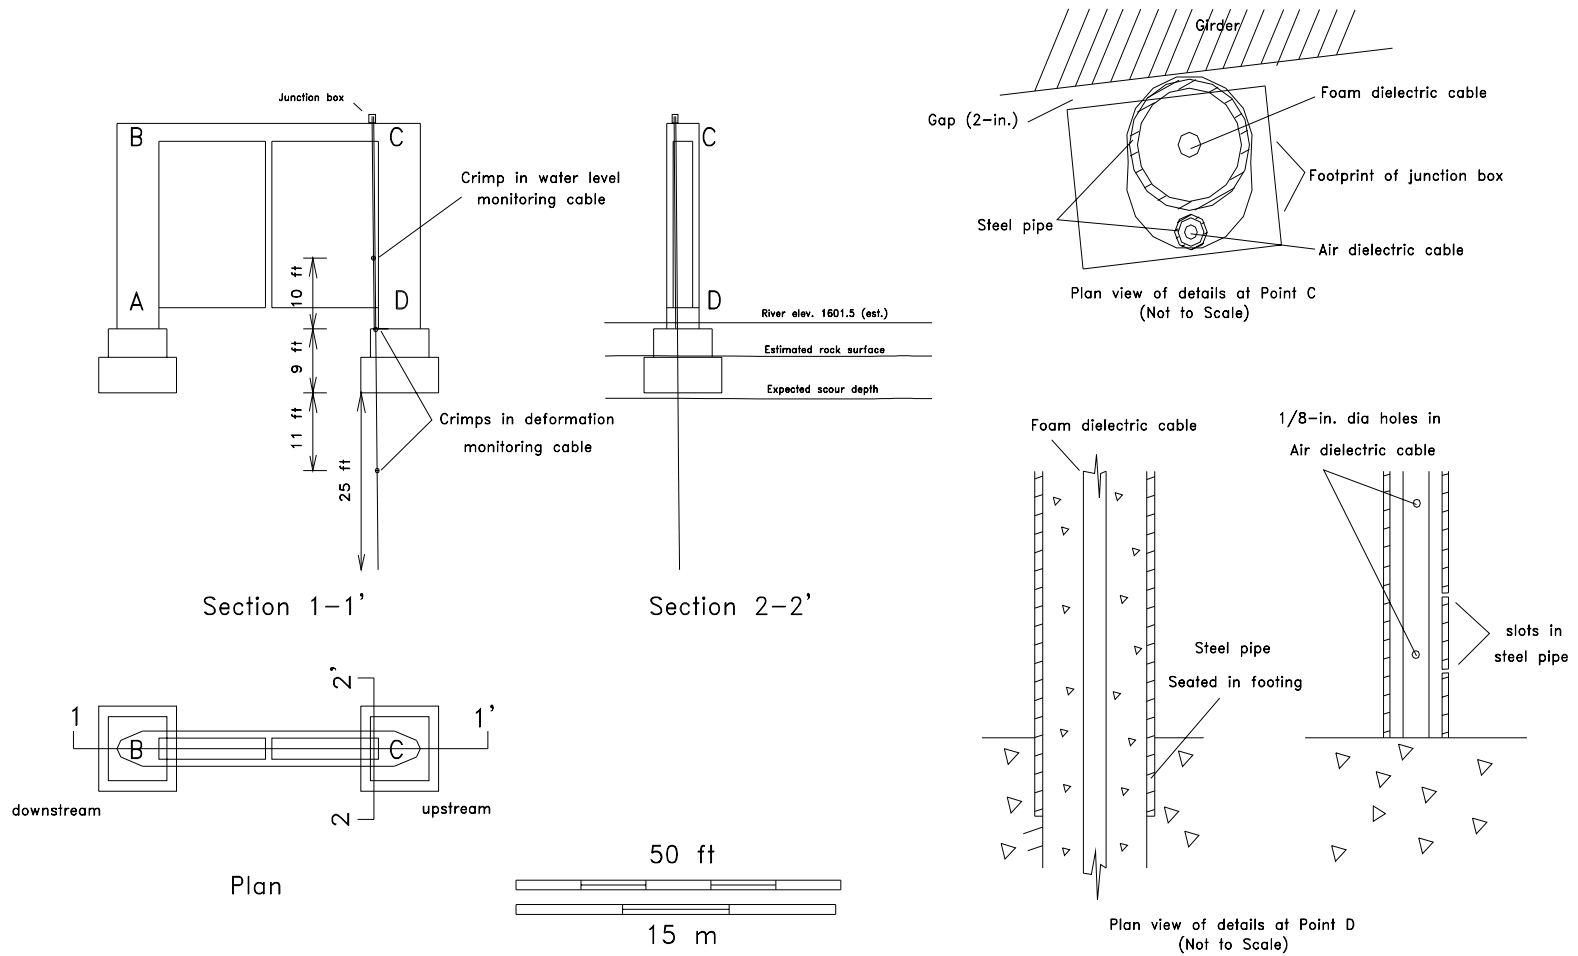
Installation details for deformation TDR cable of bridge 02-117 over the Klamath River, Horse Creek, CA
